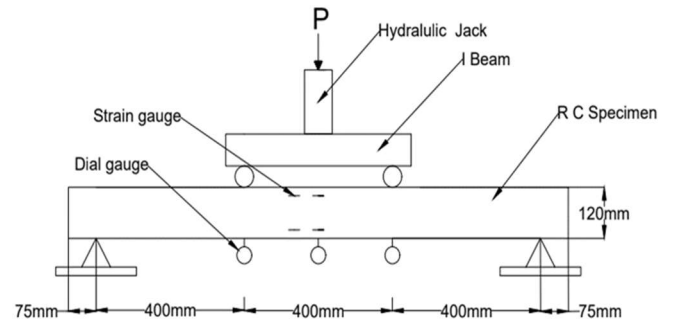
Two-point loading and position of Concrete and steel strain gauges
